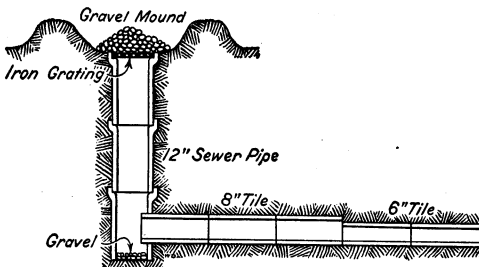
Surface inlet and flushing well built up of large tile and sewer pipe.
